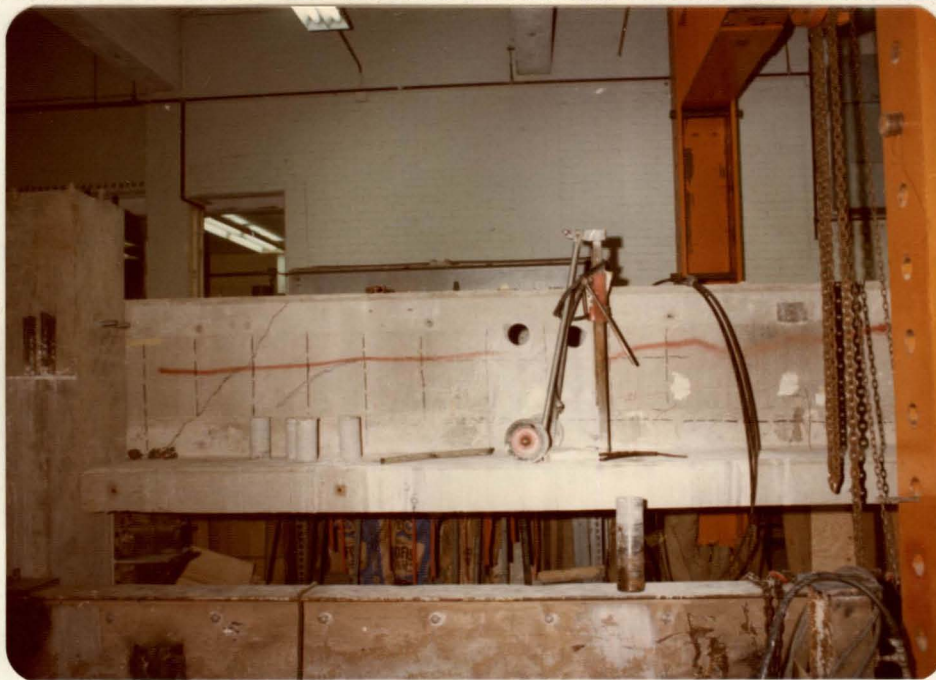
Side-View of Steel Haunch with Grout in Place. (Load Stage #6) South-End Reaction.
